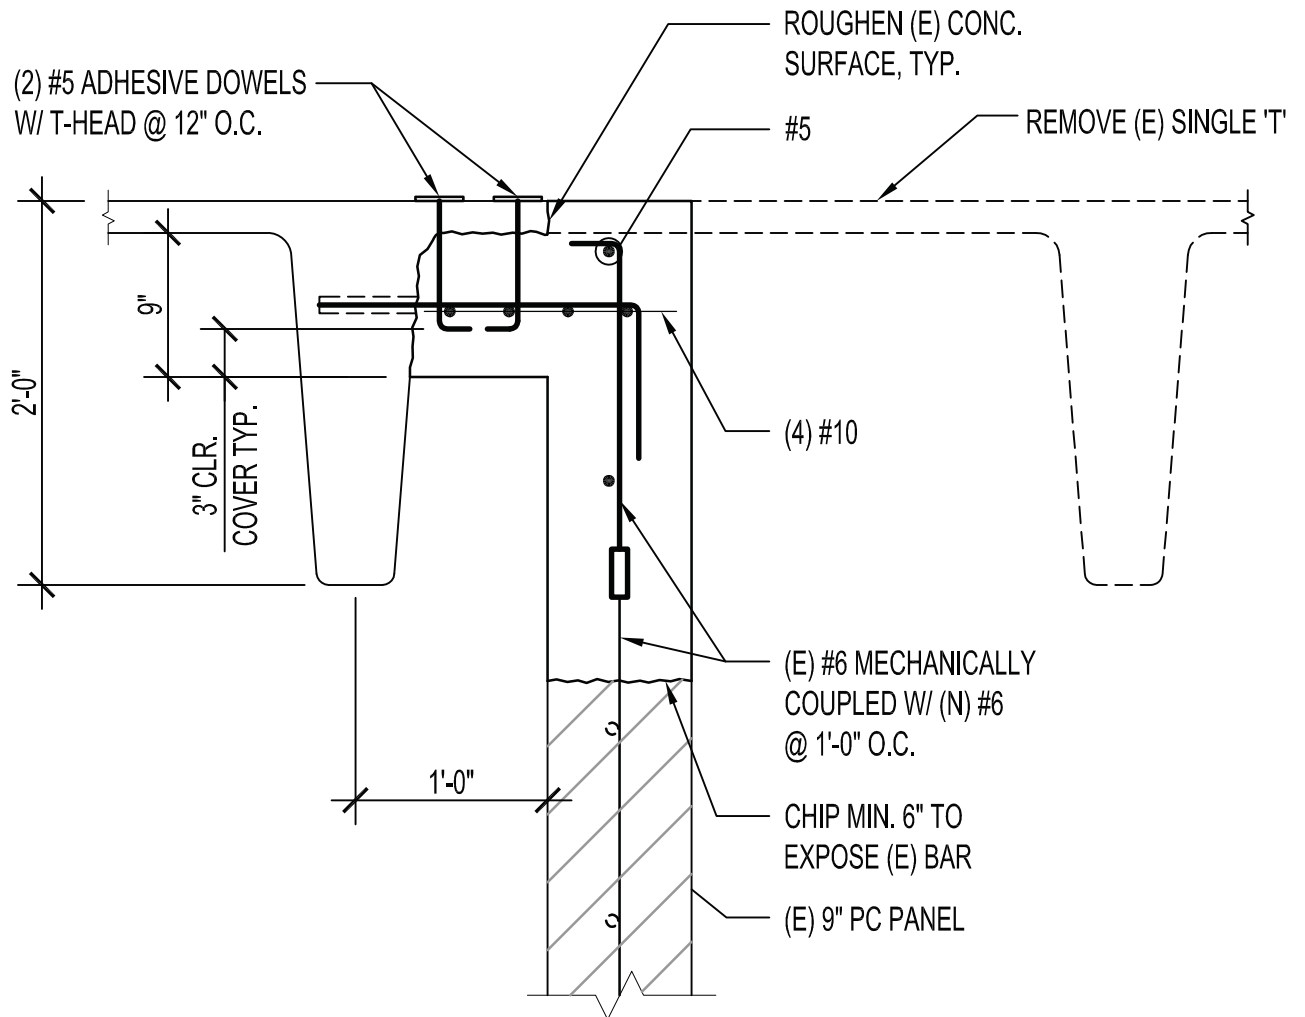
Primary Clarifier 1-4, North and South Wall
